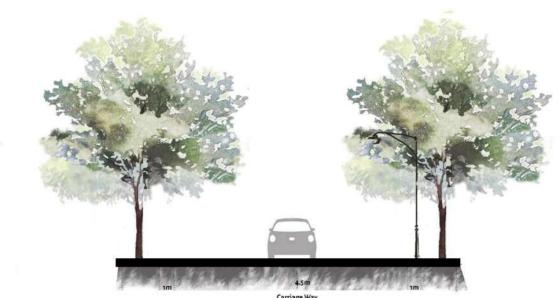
The proposed cross section for the Halpe - Badulla road
